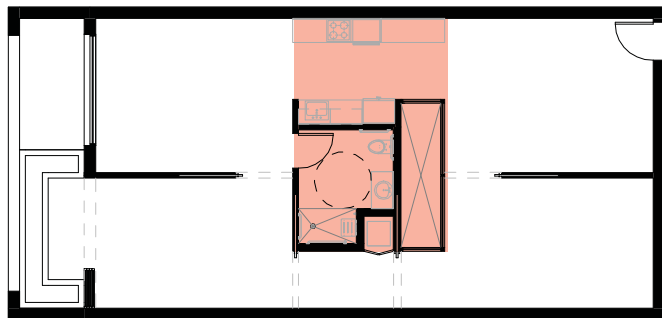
a. Typical floor plan of a unit in a block housing typology.
